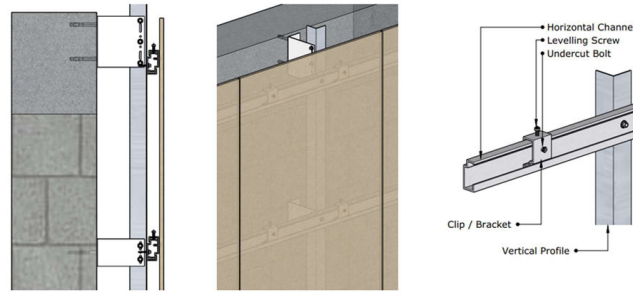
UNDERCUT FIXING SYSTEM DETAILS
